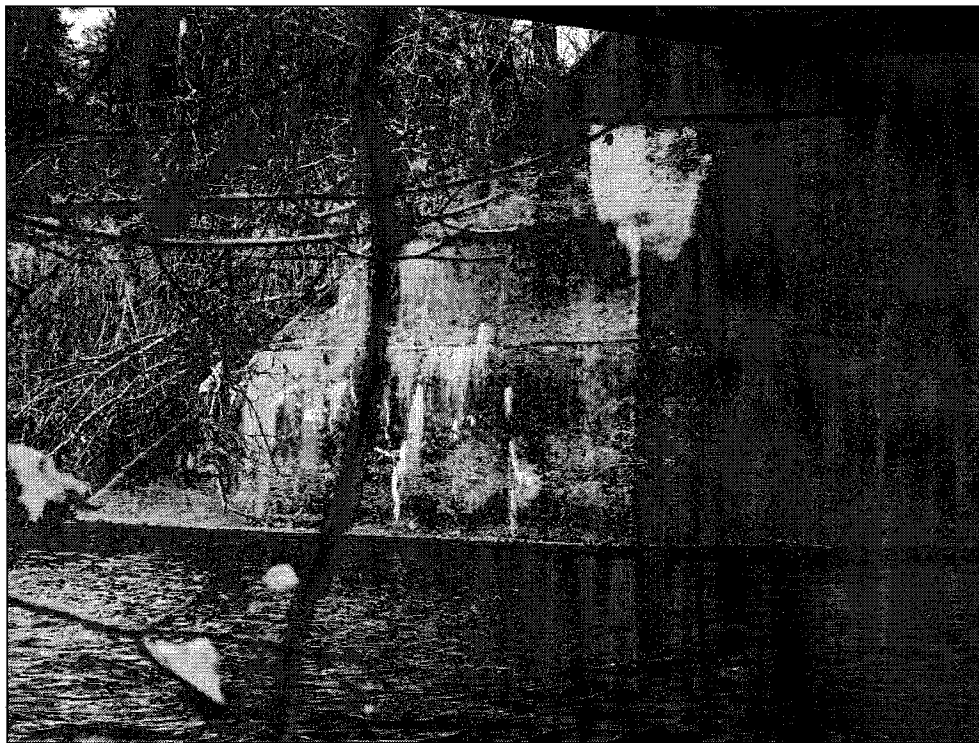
Typical Condition of East Abutment (good condition – stained cracking, isolated spalls and light scaling)
